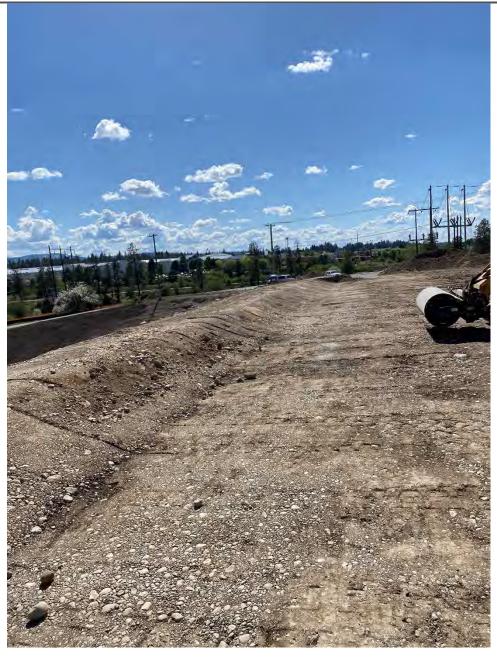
Constructing East portion of containment berm near Kemira facility.
